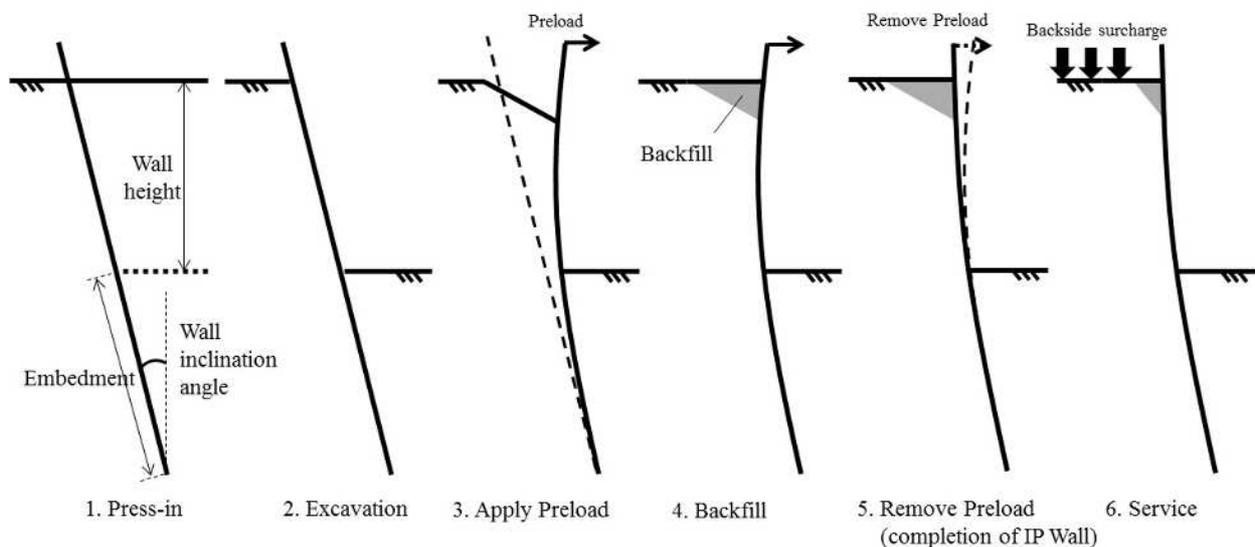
Construction procedure of Preload Retaining Wall (Ishihara et al. (2015))
